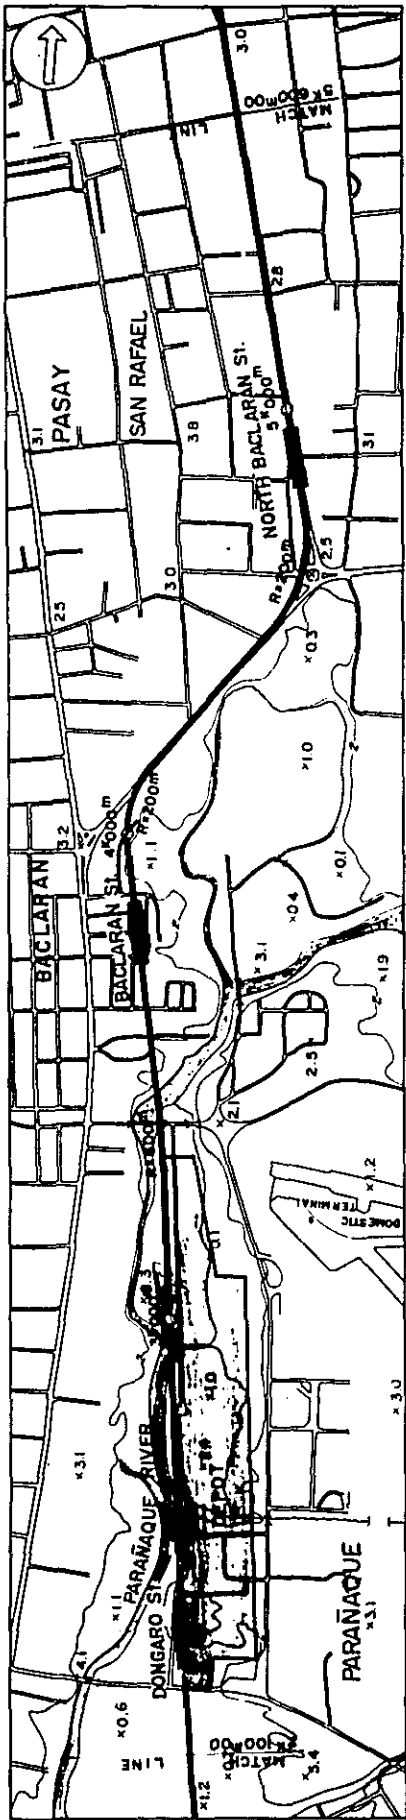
Plan and Profile for Elevation of Taft Avenue (1)
